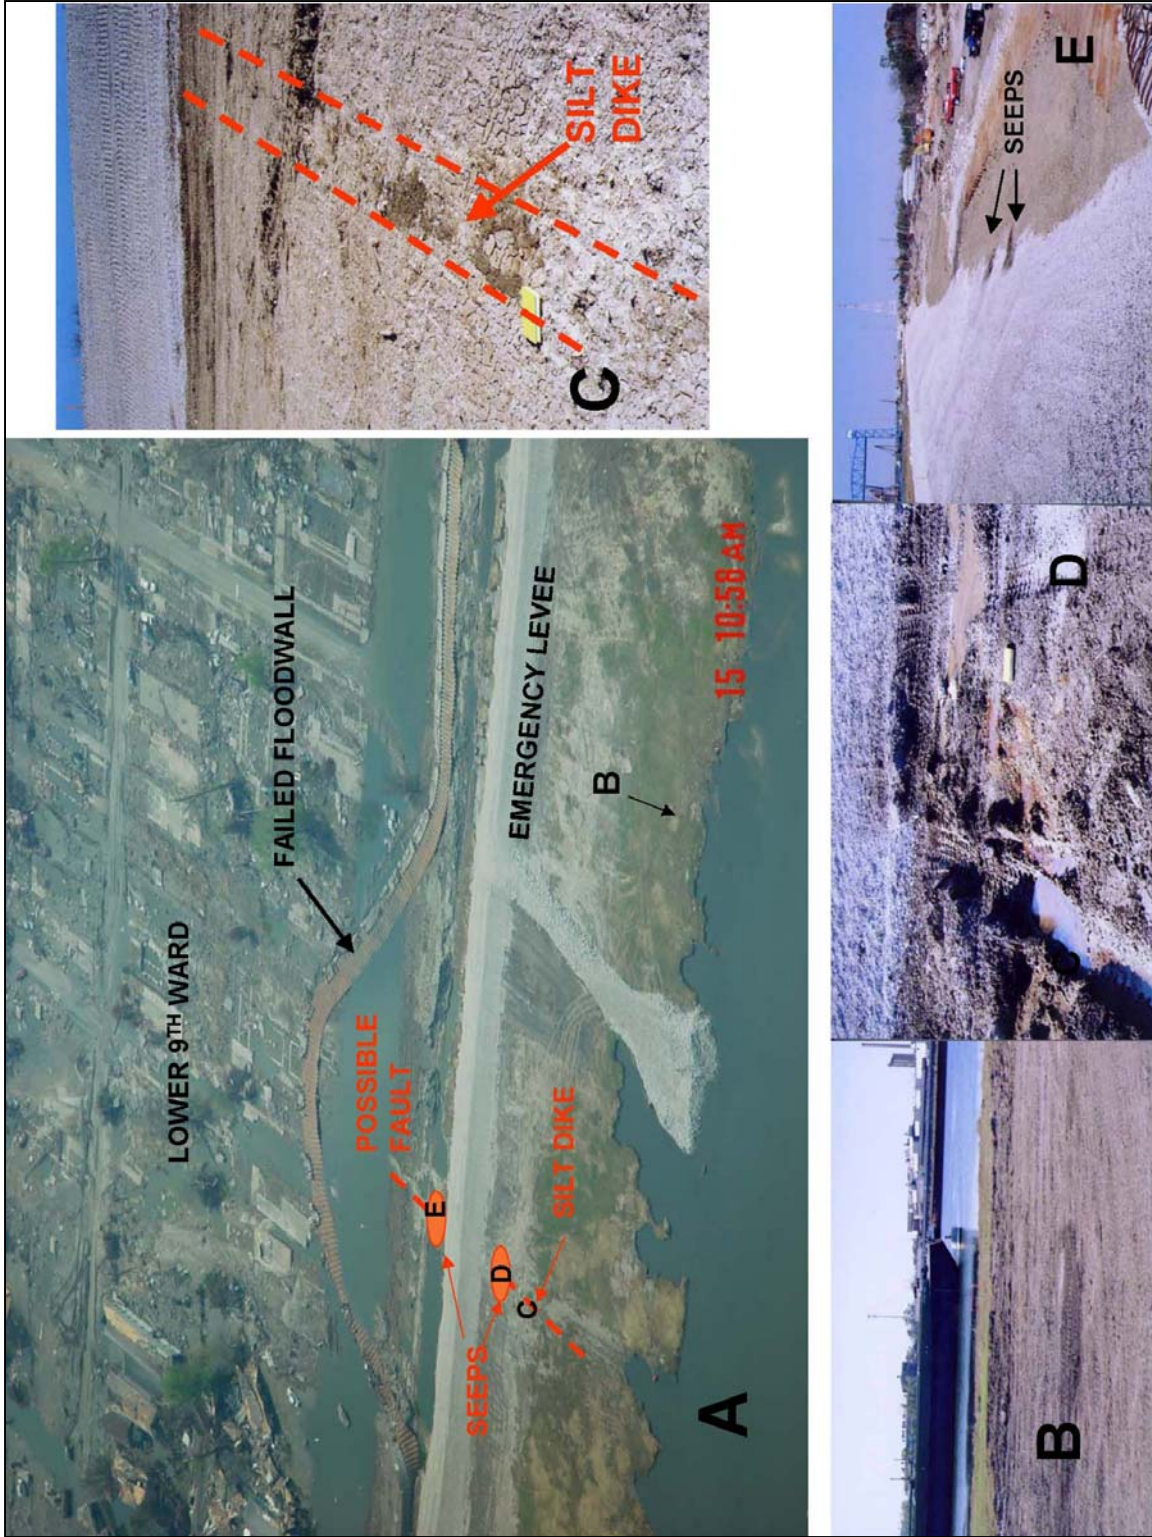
Floodwall breach on the east side of the Inner Harbor Navigation Canal in New Orleans. A. View looking southeast across area of floodwall failure. Uprooted steel sheet piles capped with concrete are clearly visible. B. View of canal batture looking west. Water level in the canal is approximately 1 to 1.5 feet below batture land level. Except where disturbed by vehicle movement, the batture in this area is grass-covered and not deeply scoured by water flow. C. Water seepage along possible silt dike. D. Seepage through possible silt dike at base of emergency levee, canal side. E. Seepage at base of emergency levee, east side. These seepage patches align with the possible silt dike on the west side of the levee.
